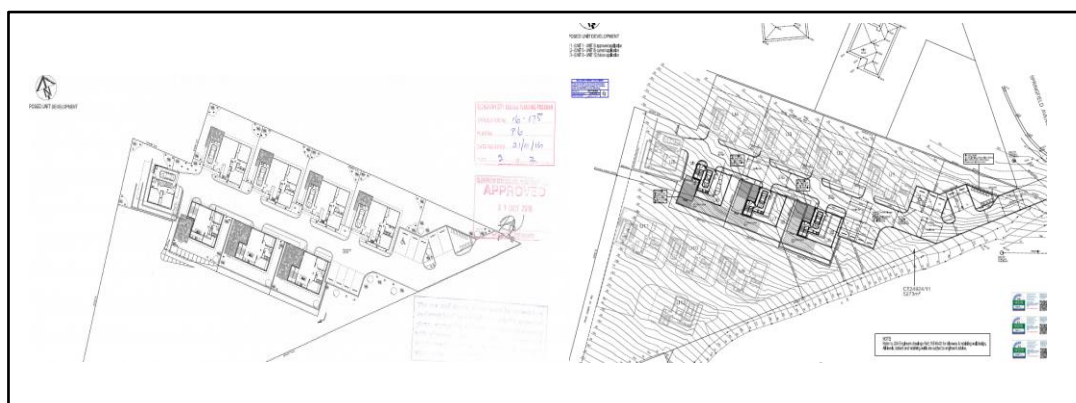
Approved Plan Planning PLN-16-175 and Building BP 17/0006 (3 Dwellings)
